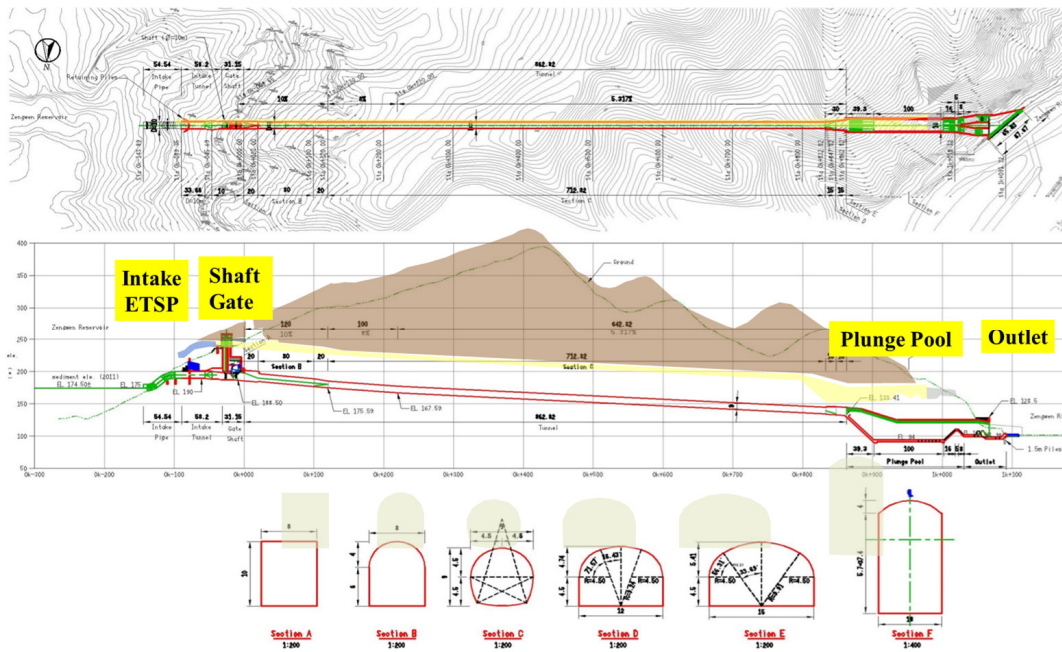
Layout of desilting tunnel in Zengwen Reservoir
